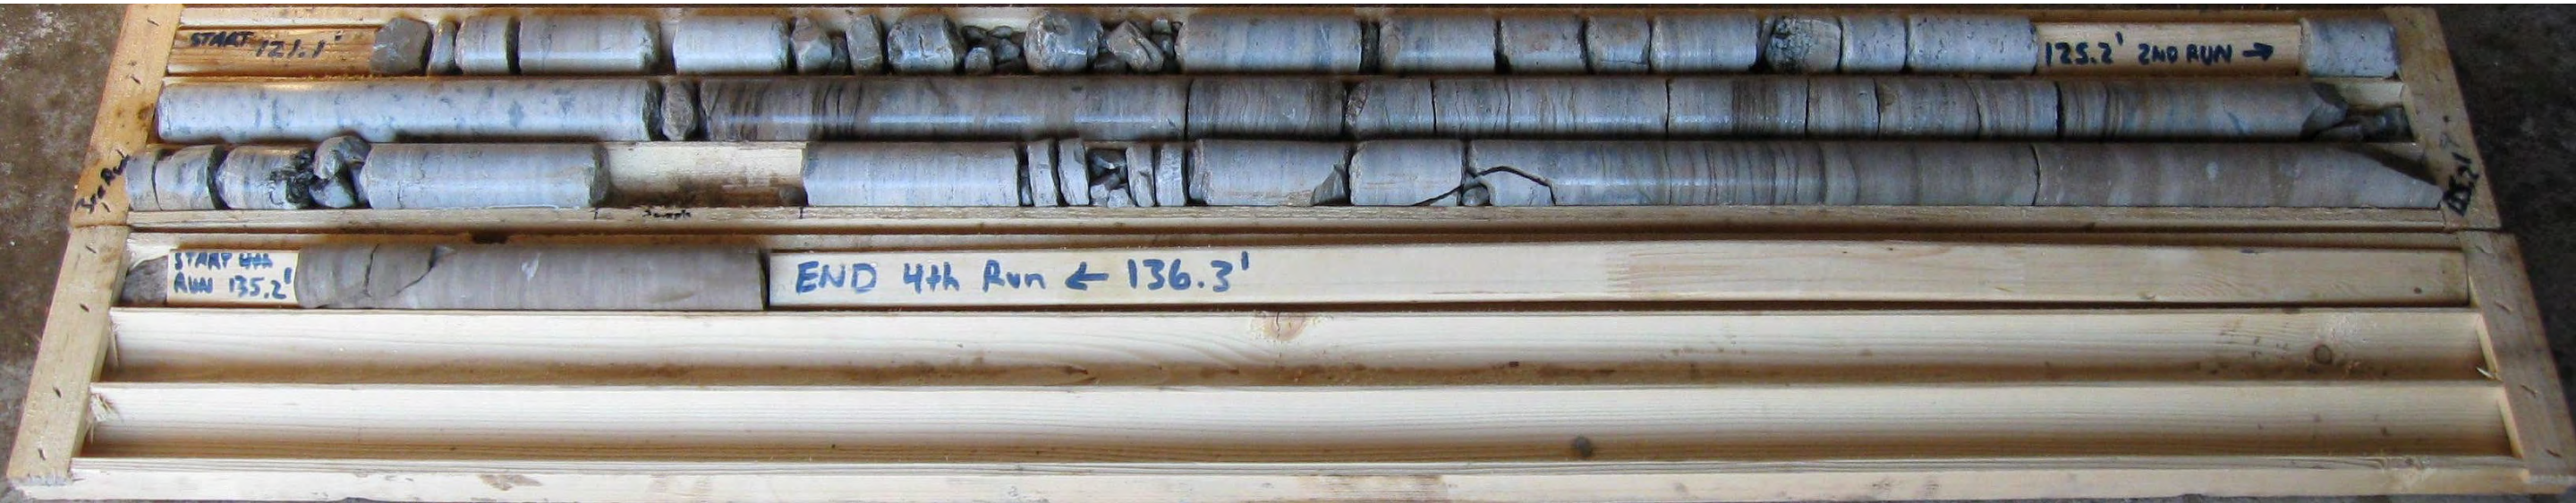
Borehole No. 109 – Rock Core. Elevation 149.18 metres to 143.79 metres.
